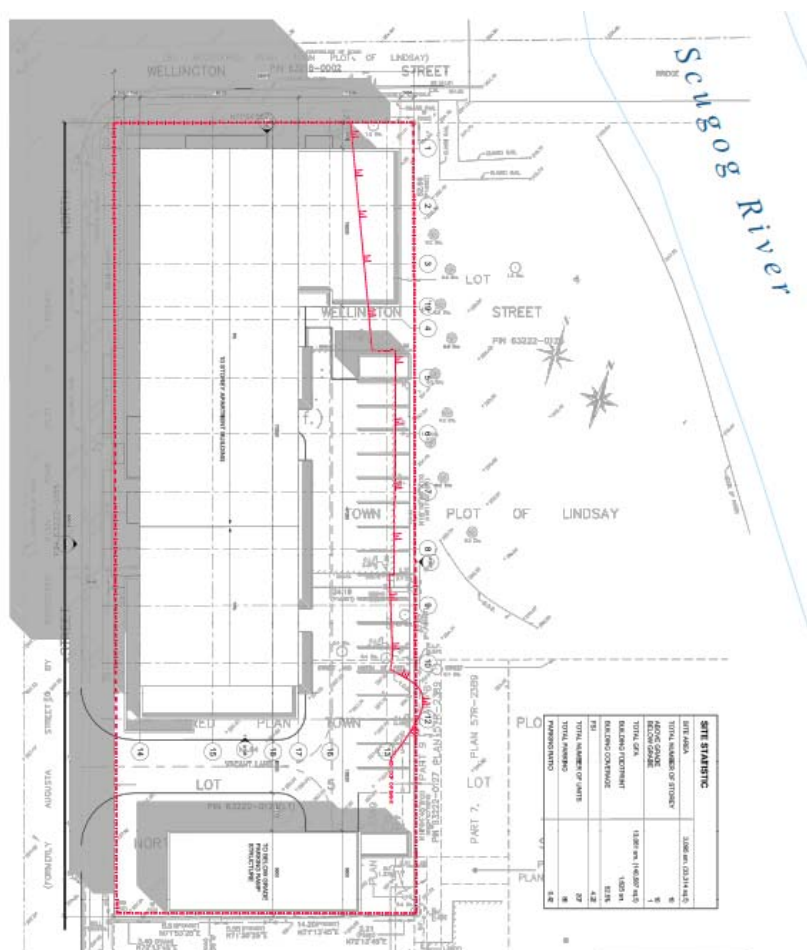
Site plan for proposed development (Source: EcoVue Consulting Services Inc., June 10, 2020)
